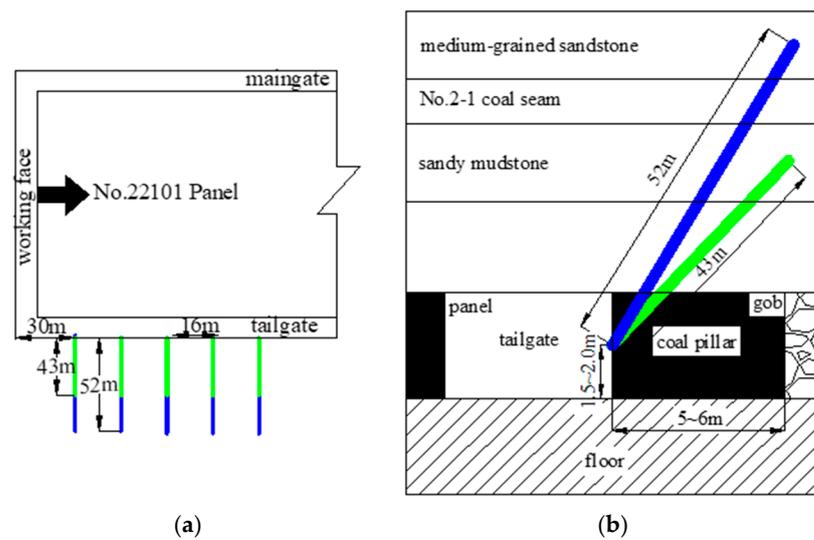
Plan and section of the hydraulic fracturing borehole in panel preparation stage of No.22101 Panel. (a) Plan. (b) Section.
